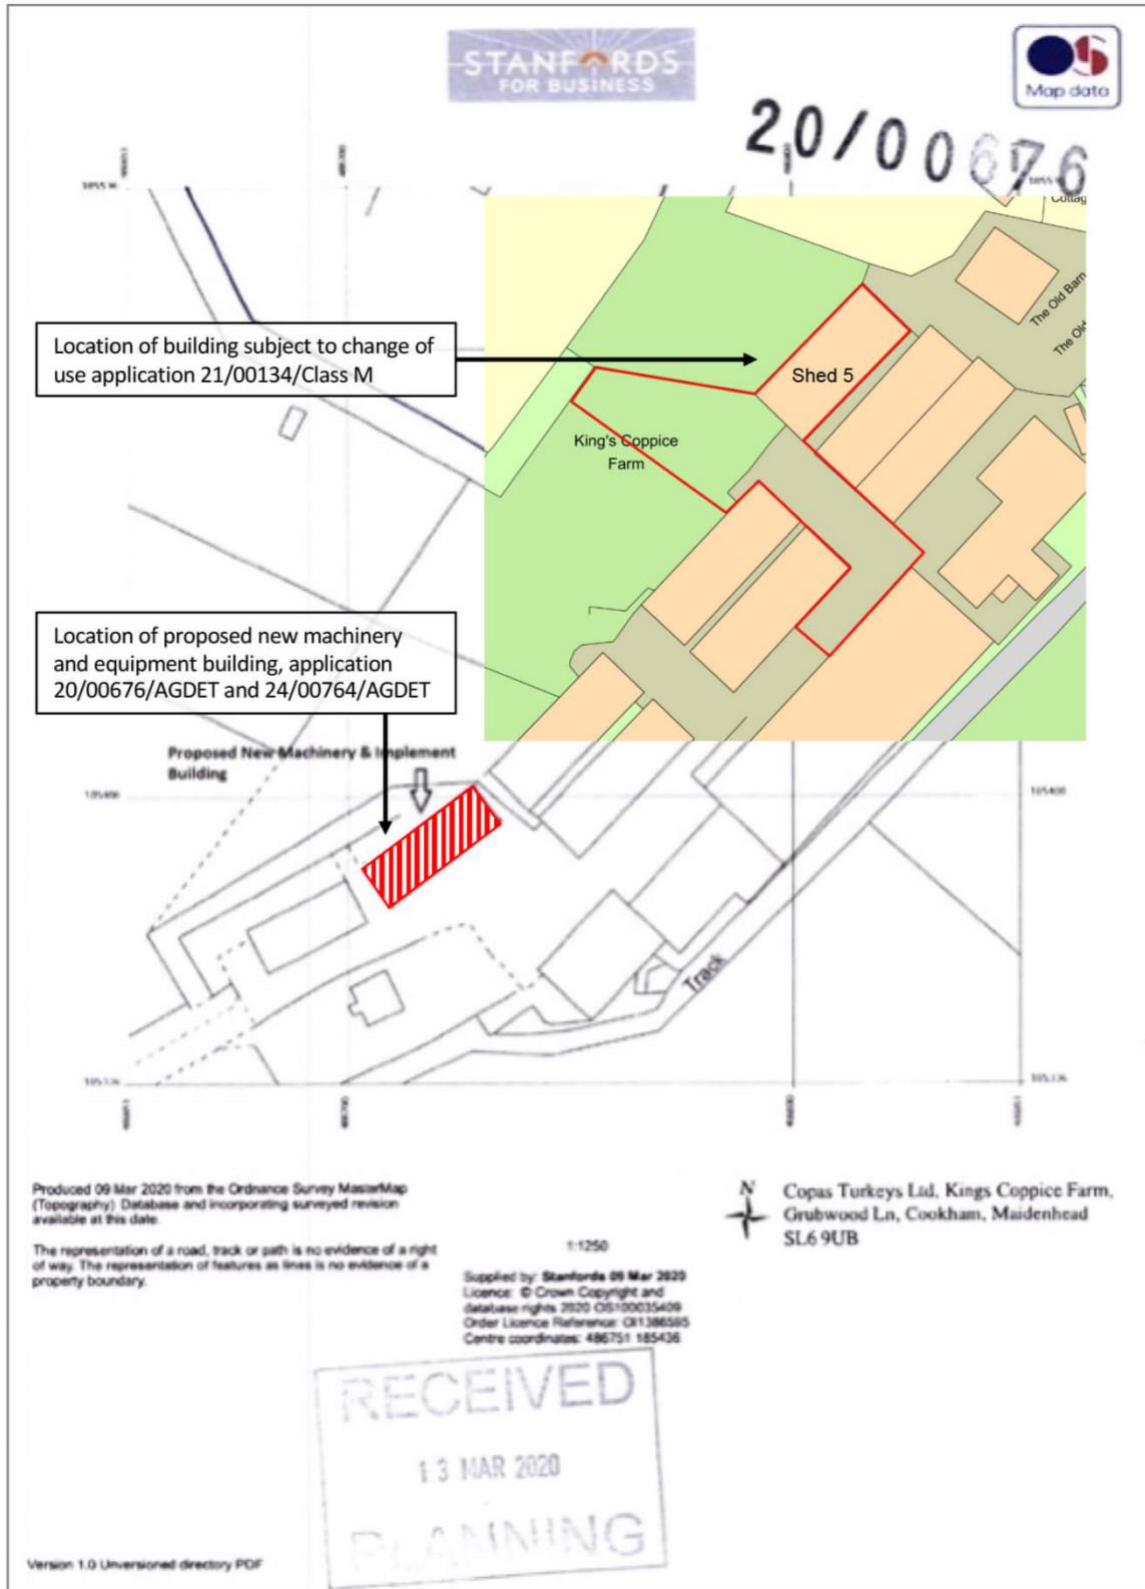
Location Plan submitted with Prior Approval application showing location of proposed new machinery and equipment building overlain with extract from location plan submitted with Prior Approval application for change of use of existing building from agricultural to light industrial use
